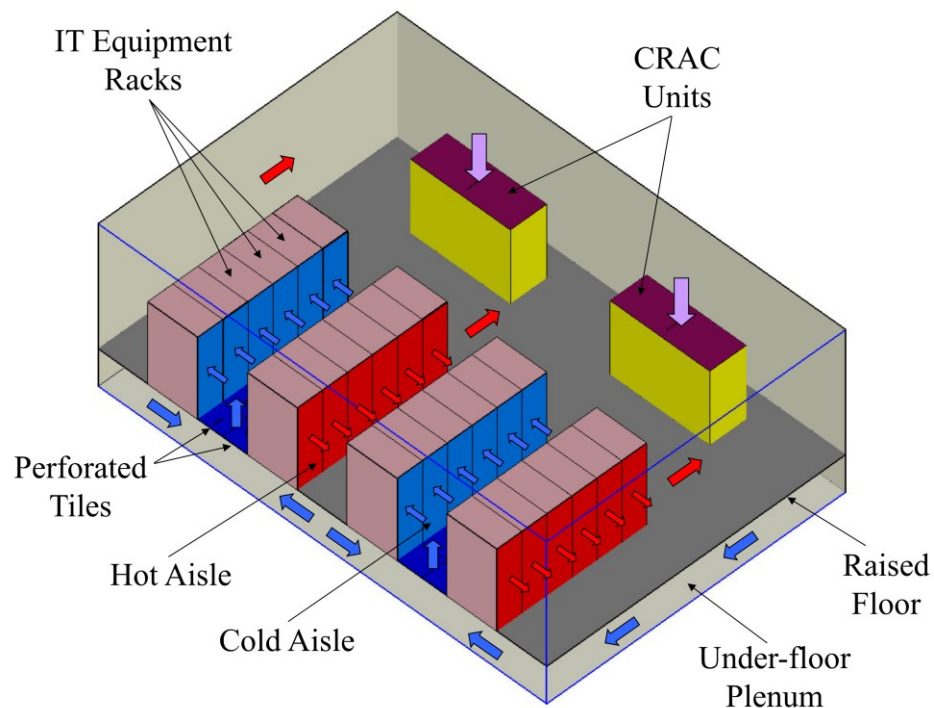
Hot and Cold Aisle Raised Floor Data Center Layout
